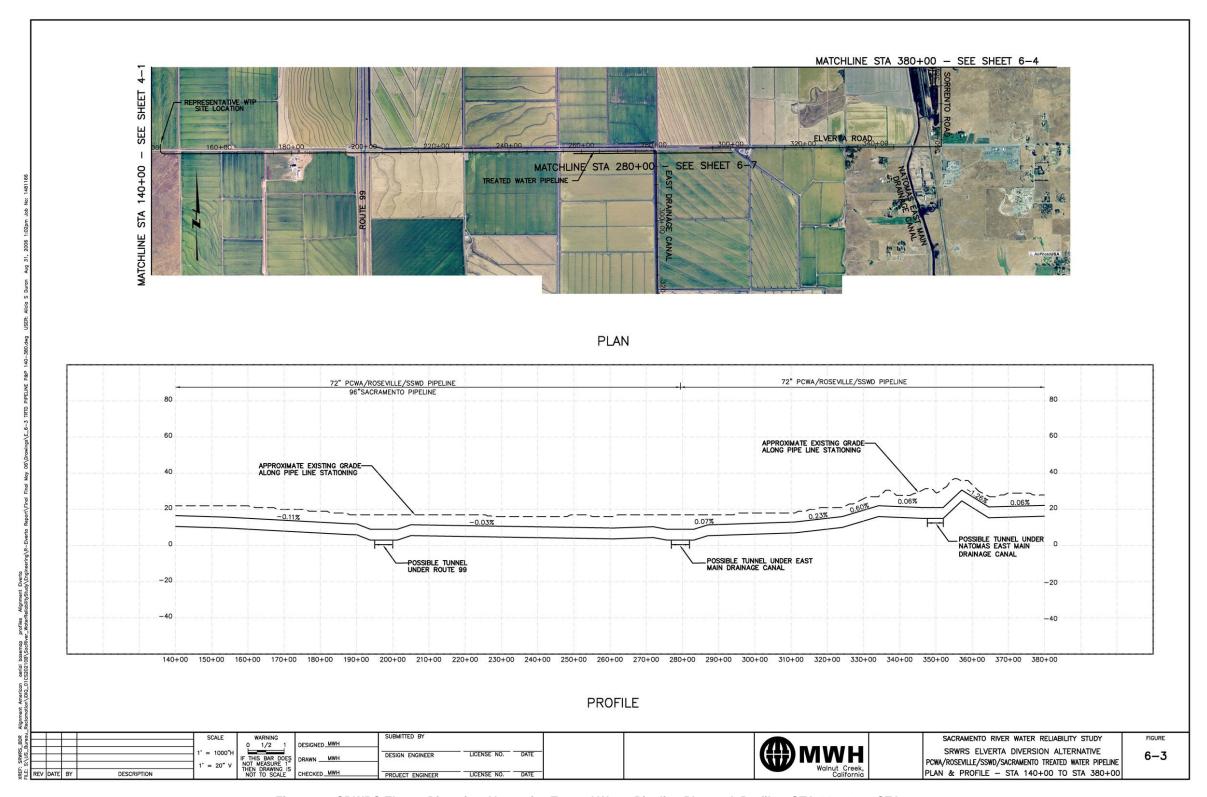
SRWRS Elverta Diversion Alternative Treated Water Pipeline Plan and Profile – STA 140+00 to STA 380+00
